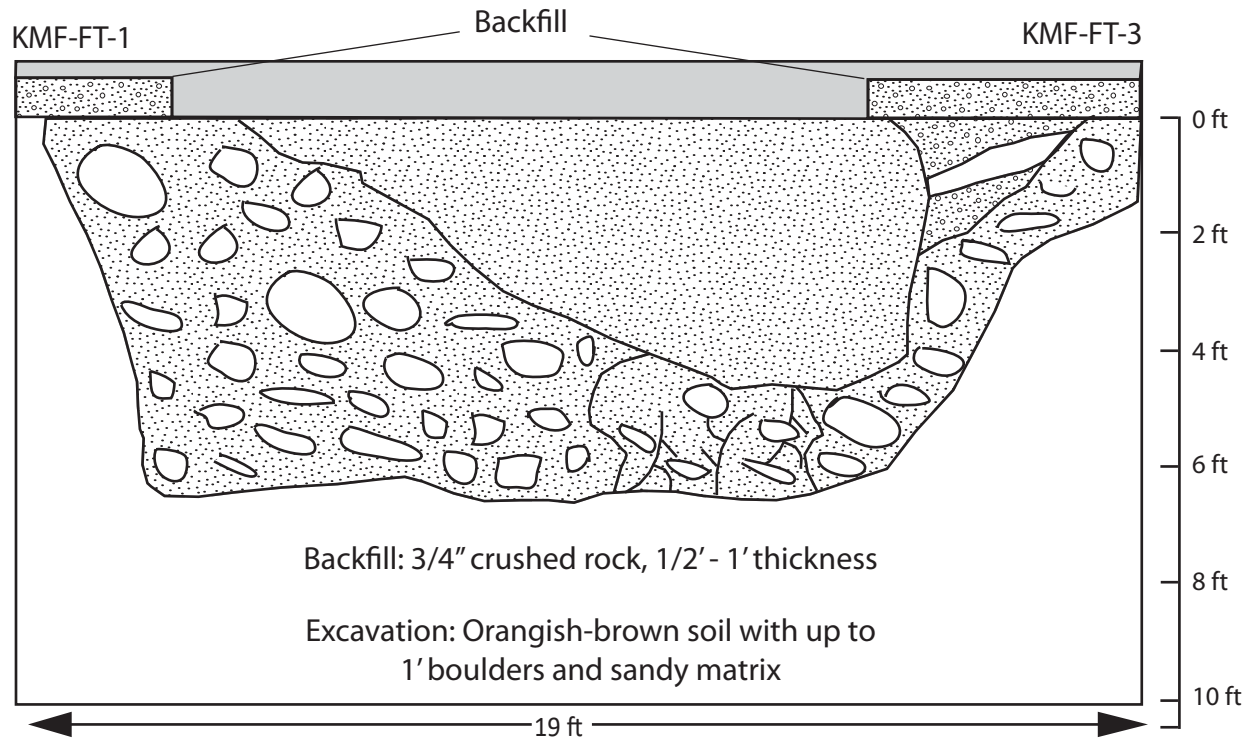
Cross-section through trench along KMF Diesel AST Excavation Site.
